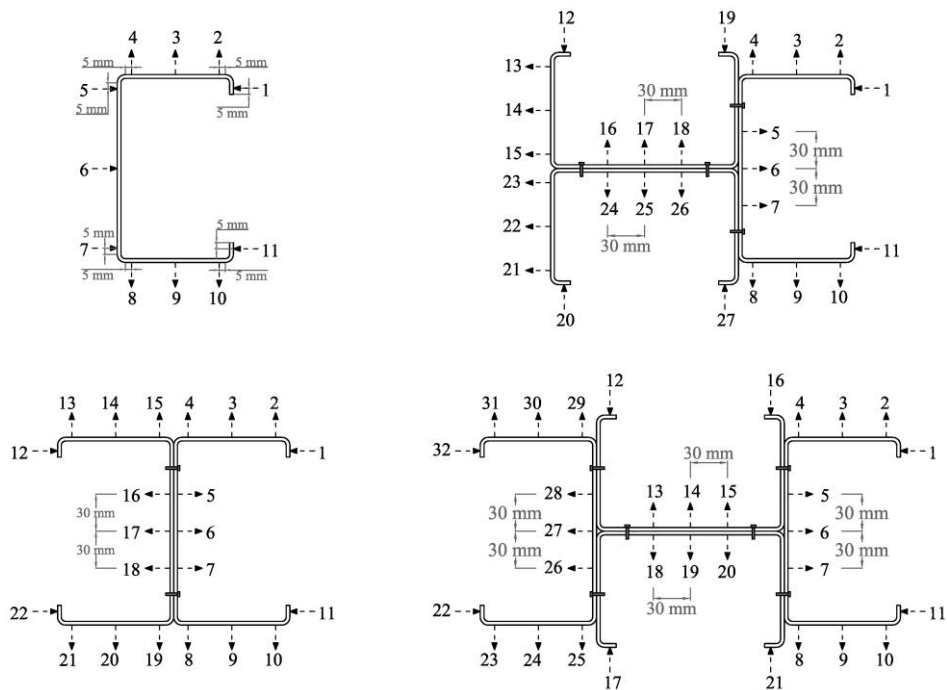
Location of laser lines for a single section and built-up assemblies
